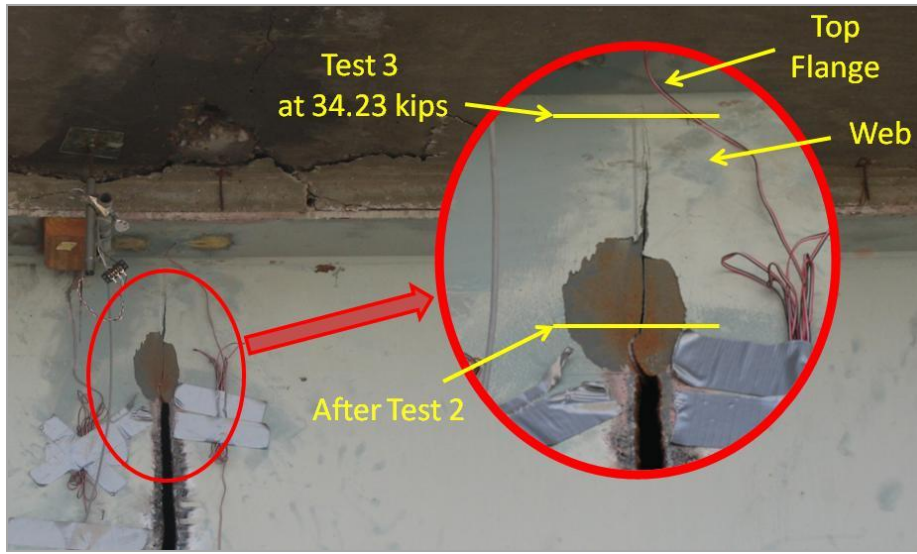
Fracture propagation on the exterior web of the fractured girder
